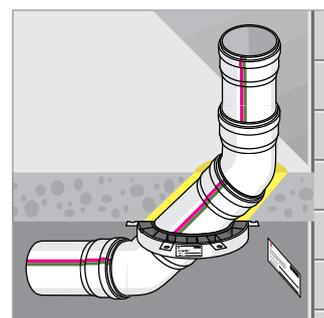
Angled fireproofing collar (only for installation on ceiling)
